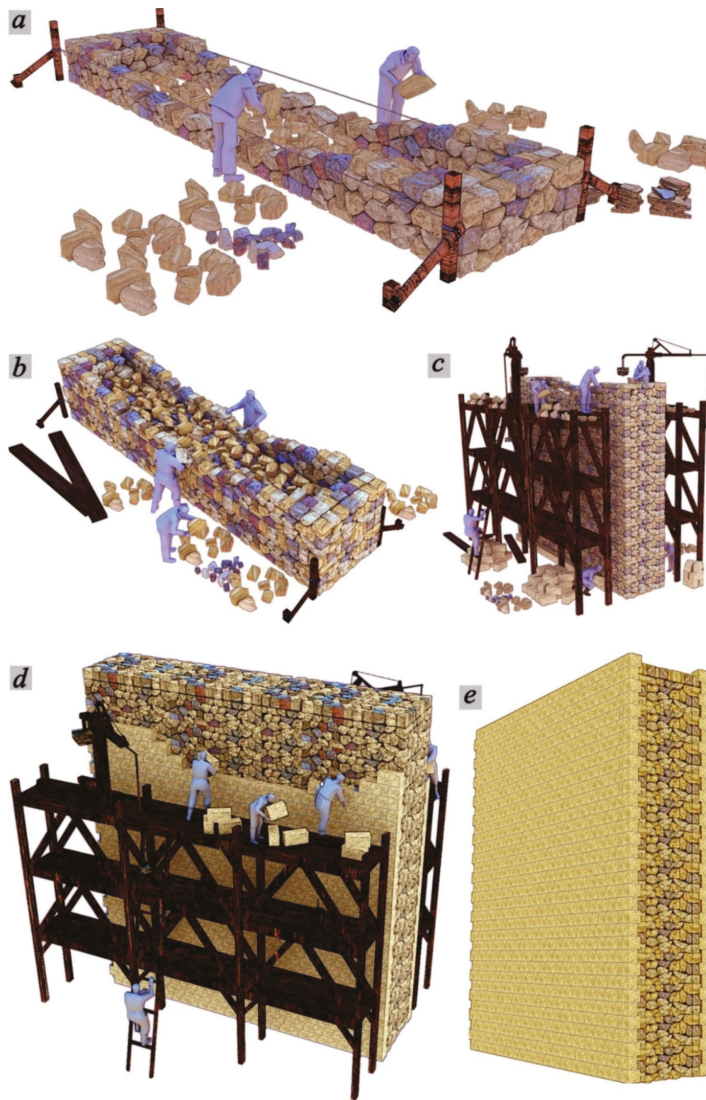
Construction hypothesis (II): (a–c) construction of the inner core layer by randomly piling up undressed, rough stone, which was bound with mortar without being committed to horizontal courses; (d) construction of the two outer leaves with regular well-dressed stone-blocks; (e) the full tree-leaf stone masonry wall.
